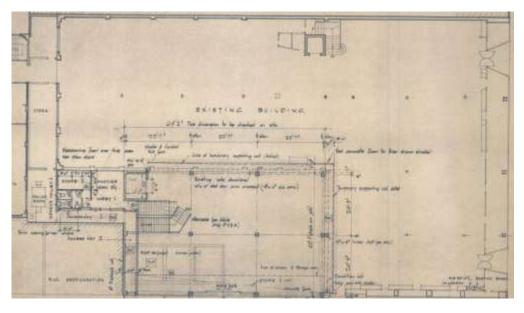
Building Ground Floor Plan from 1965 drawing by Smith Rice Lawrence & Mollison.
